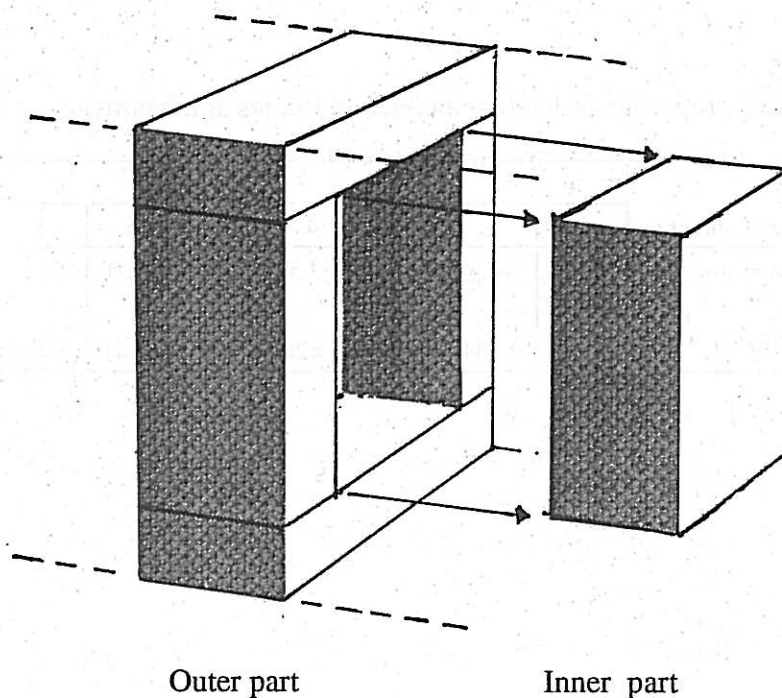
Exploded view of 50 mm slice as cut from the centre of each beam.
